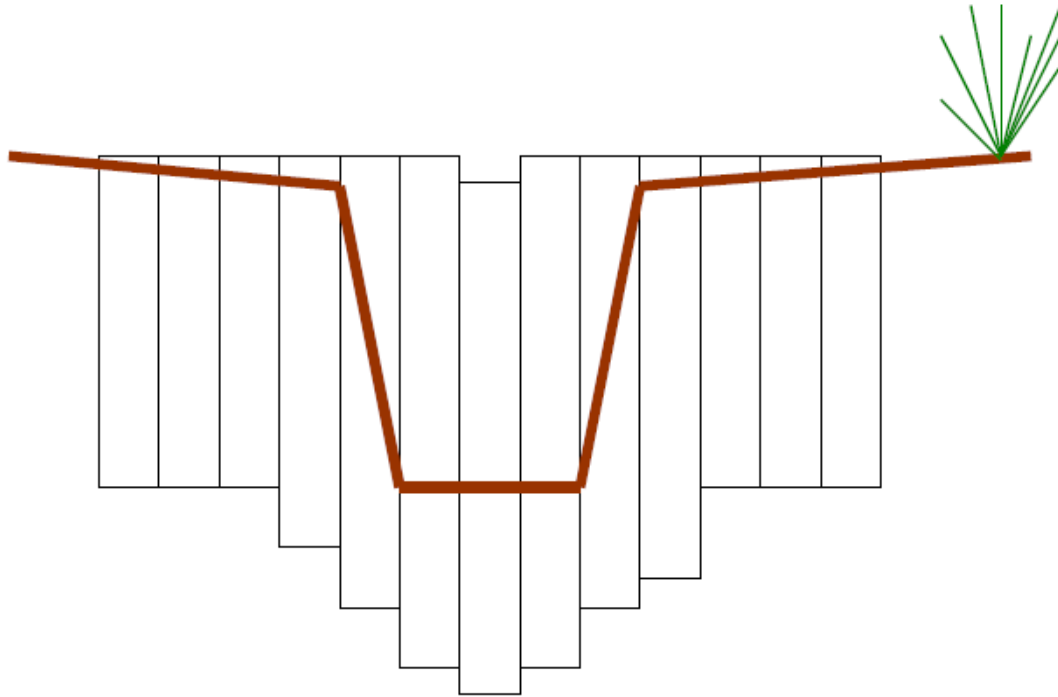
Example of a cross-section of a drain with piling inserted (NatureScot, 2019)
